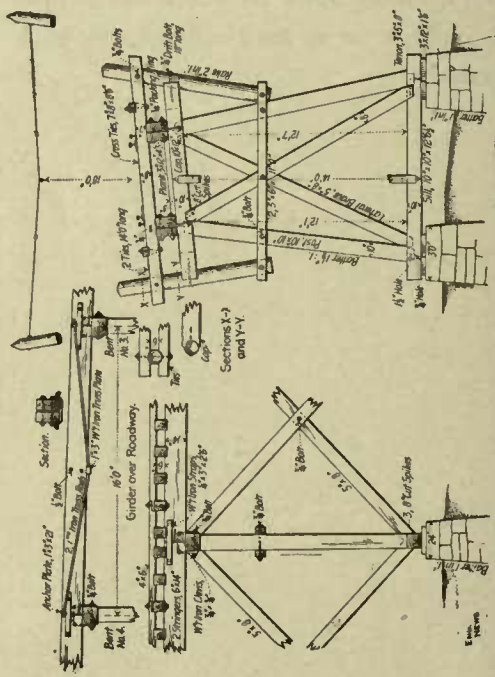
DETAILS OF BENTS AND GIRDER OVER ROAD.
